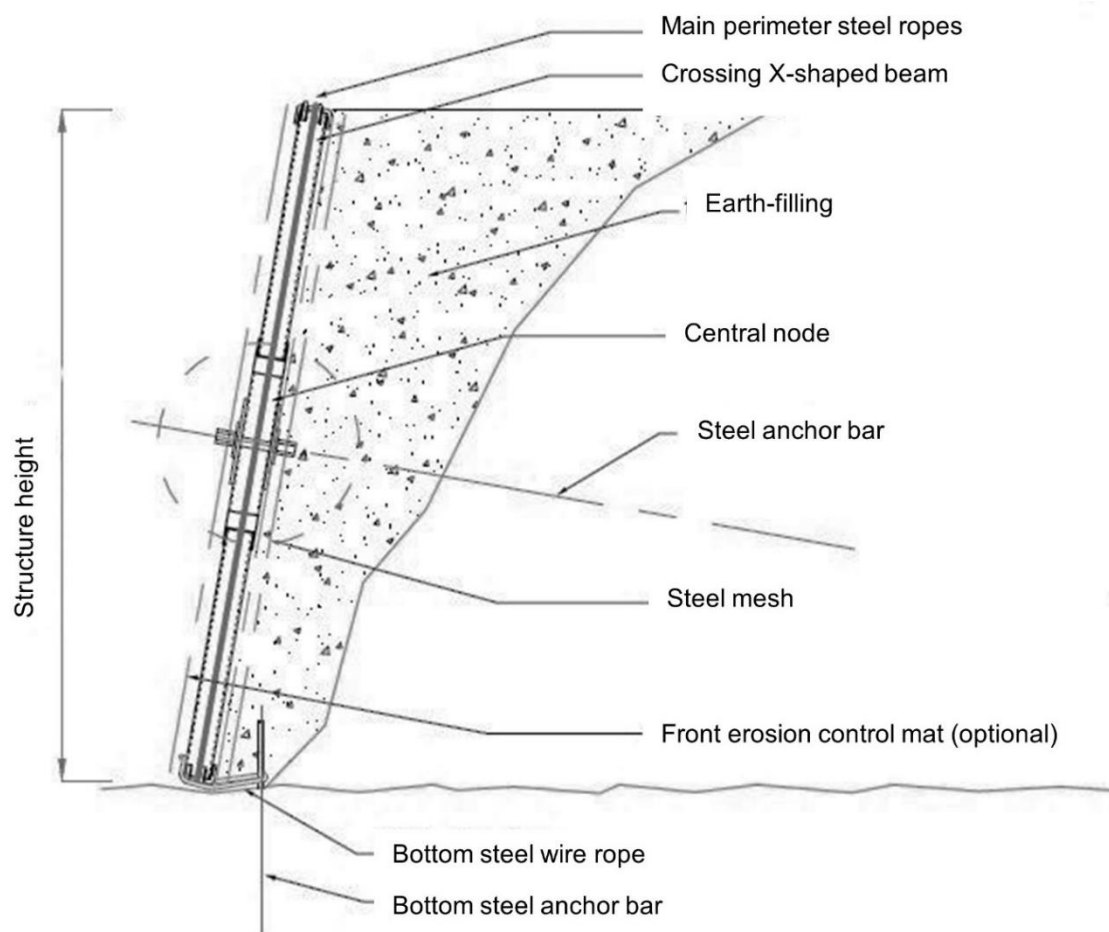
Low load-bearing earth retaining structures for slope stabilisation
